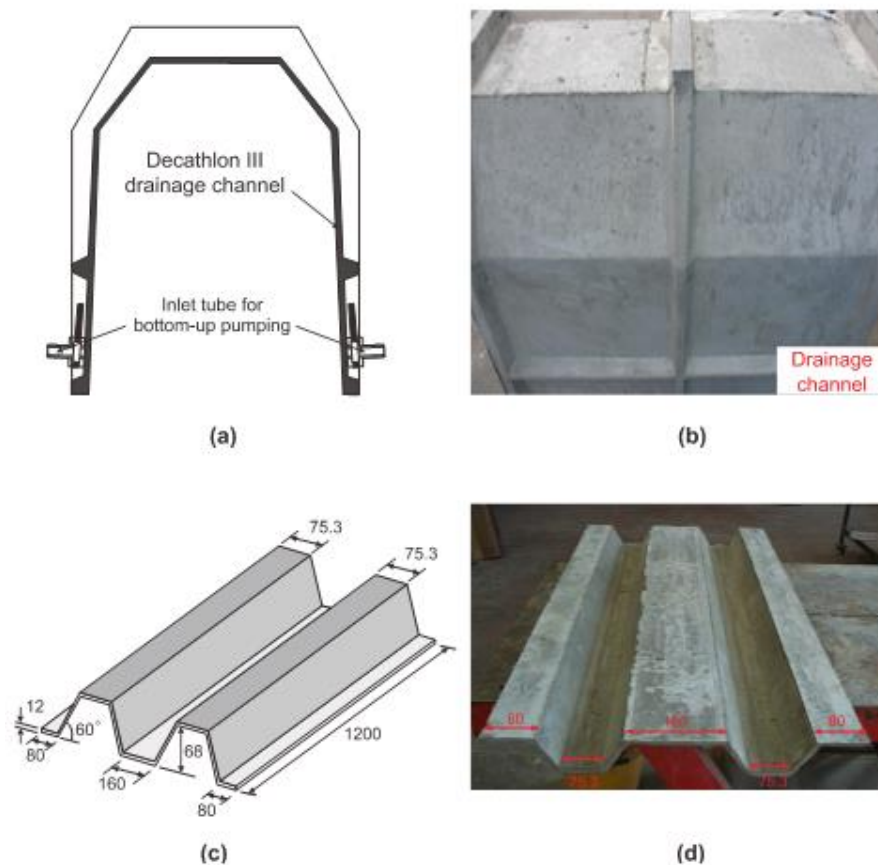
Proof of concept products: (a) schematic view of drainage channel, (b) channel specimen after casting, (c) schematic view of formwork, and (d) formwork specimen after casting and demoulding.
